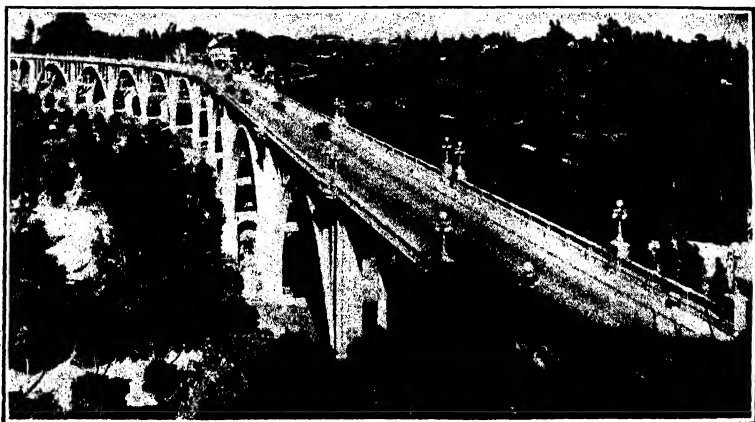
Arroyo Seco bridge at Pasadena, California.
